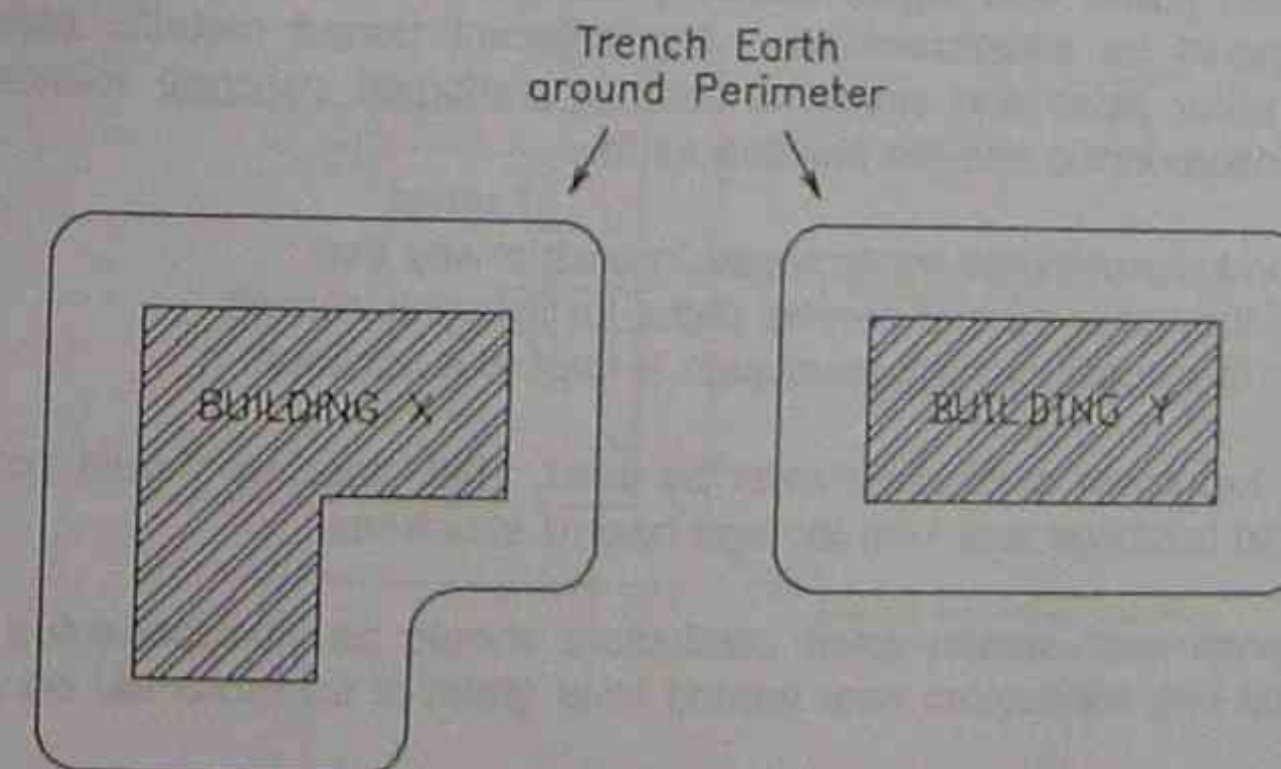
Install Trench Earths around perimeter of Buildings
